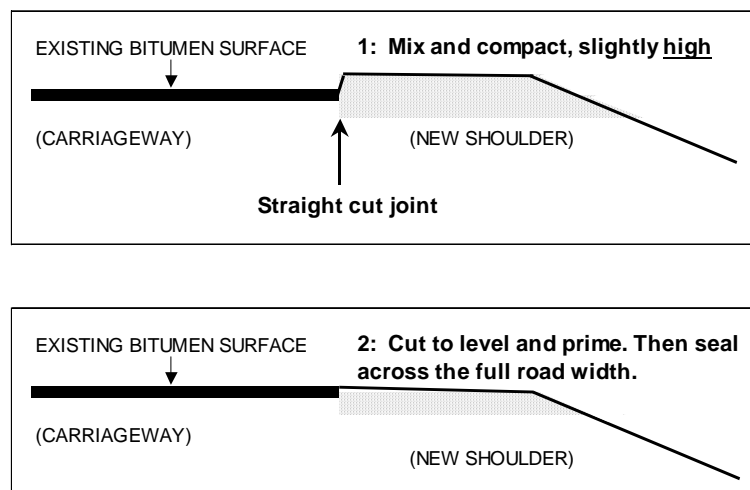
Construction of sealed shoulders to existing bituminised roads initially having unsealed shoulders
